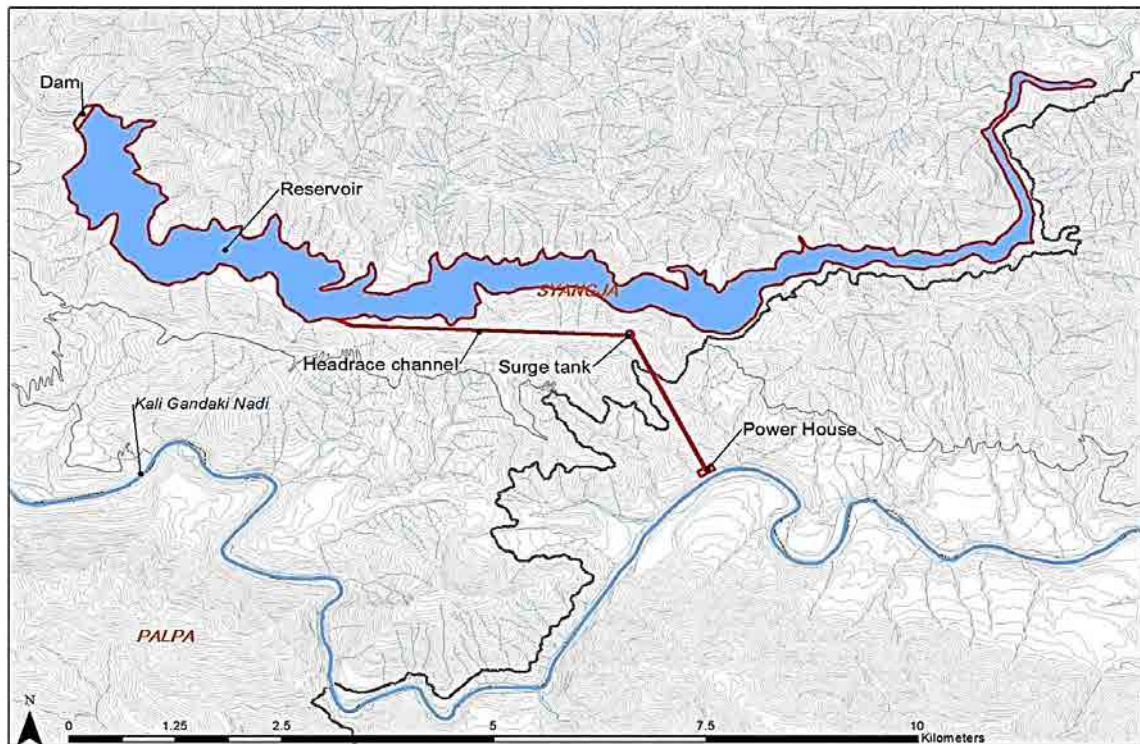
General Layout of the Andhi Khola Project (C-08)
